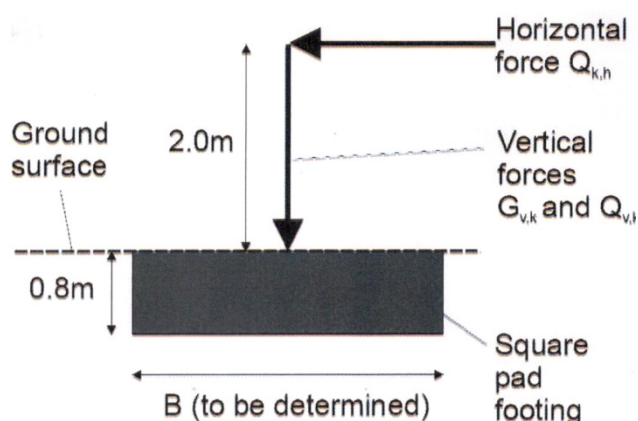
Example 2.2 – Pad foundation with inclined load design situation
